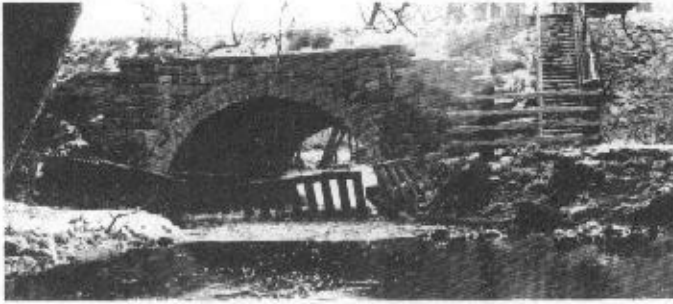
BURNETT'S CREEK ARCH, 1974: NORTH PORTAL OF TWENTY-FOOT ARCH CARRYING WABASH AND ERIE CANAL OVER BURNETT'S CREEK, CARROLL COUNTY, BUILT 1839-1840 *Courtesy of Author.
